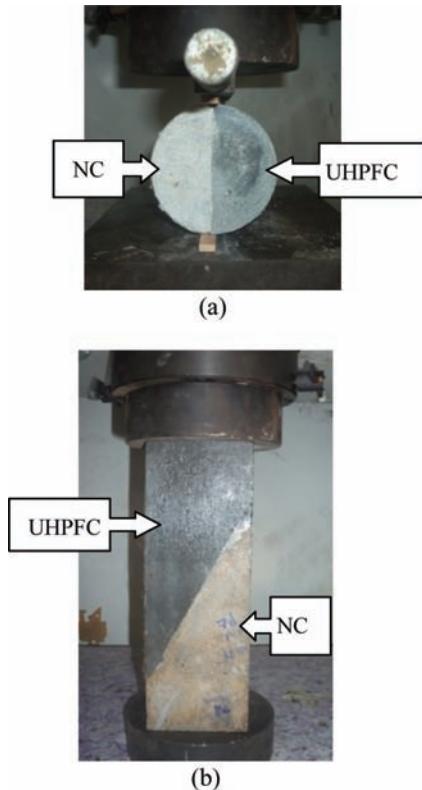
(a) Split cylinder specimen and (b) Slant shear test specimen.
